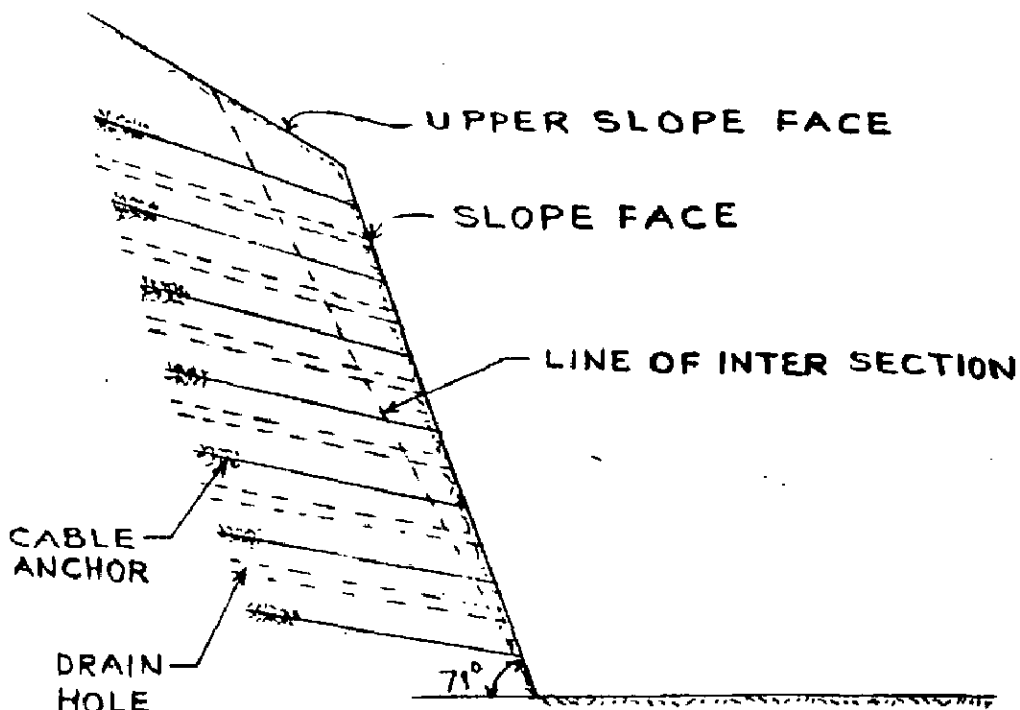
; PROVISION OF CABLE ANCHORS TO FORM REINFORCED ROCK BREAST WALL TO STABILIZE THE RIGHT ABUTMENT SLOPE.
